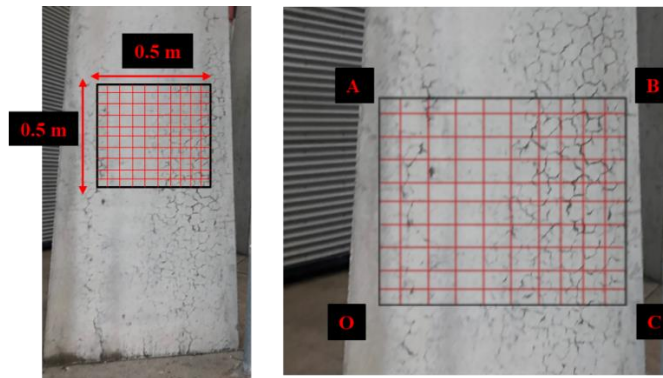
A) Cracking Index (CI) grid on damaged concrete.
